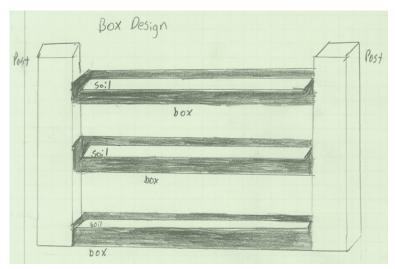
This Planter Box Railing is made of wooden boxes (Trejo).
